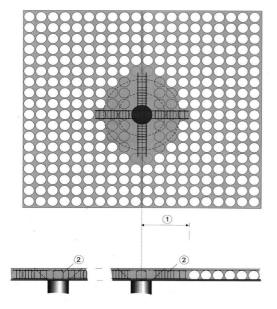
Slab without hollows in the vicinity of column: 1. Full area 2. Transverse reinforcement [1]
